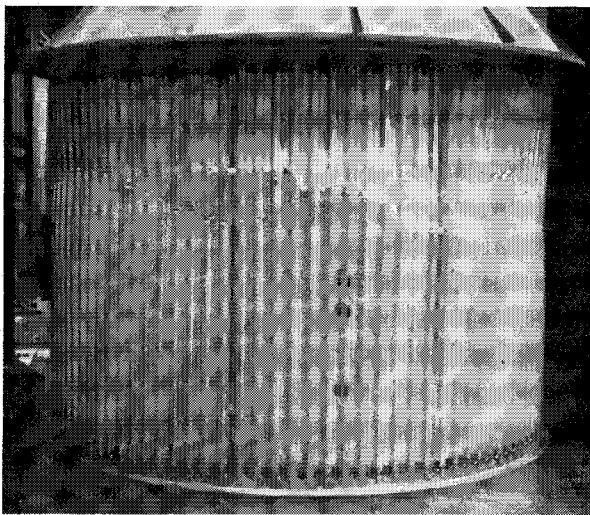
Buckled $\frac{1}{4}$ -scale test cylinder in test fixture.
